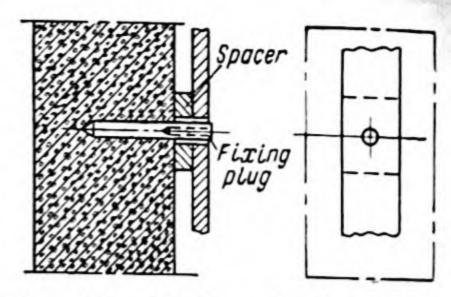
Earthing bus-bar fixing inside buildings driven with powder-actuated stud driver type CMΠ-1 (SMP-1).
